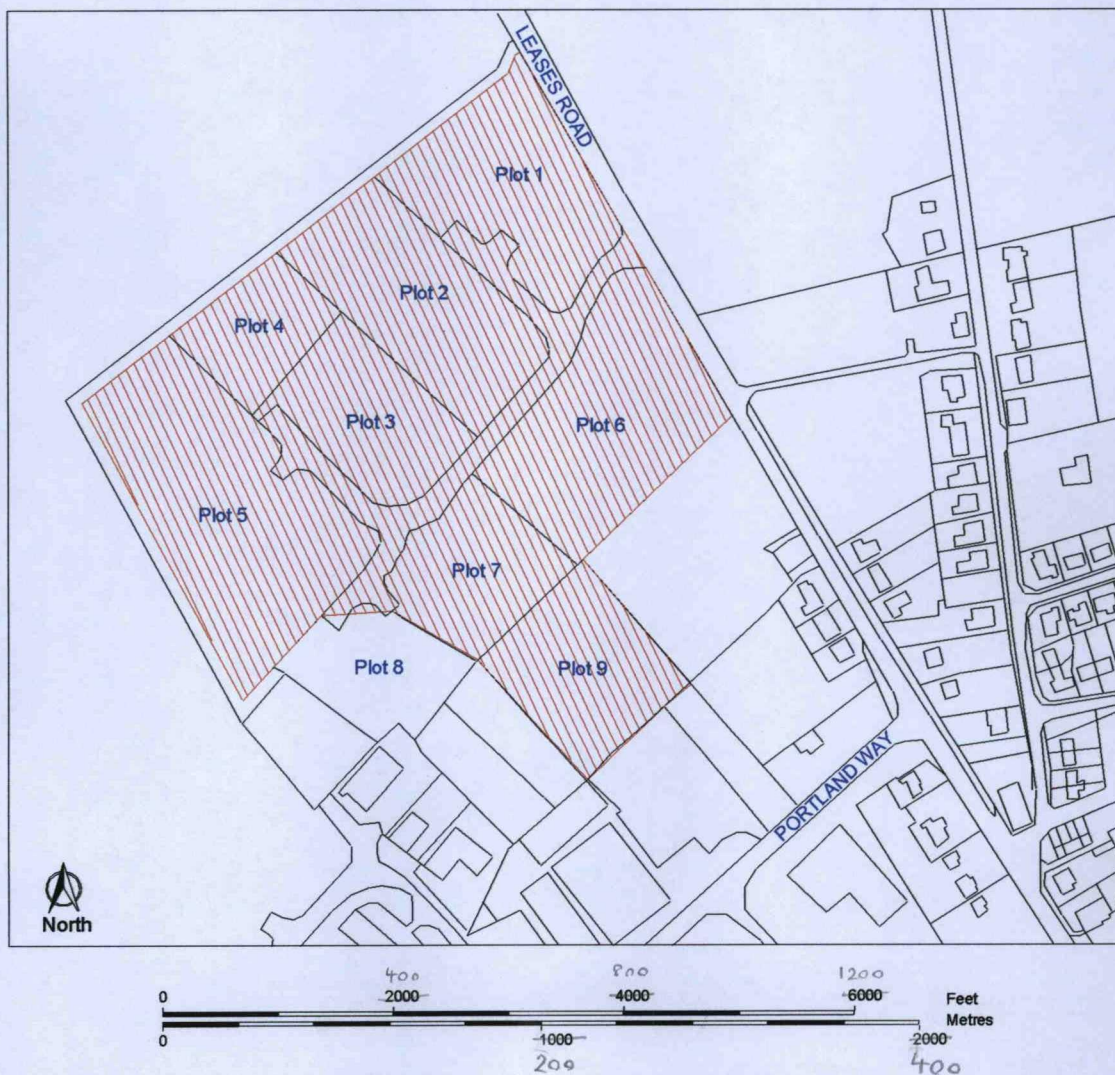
Site location plan showing areas of topsoil strip monitored. (Scale 1:2000).
